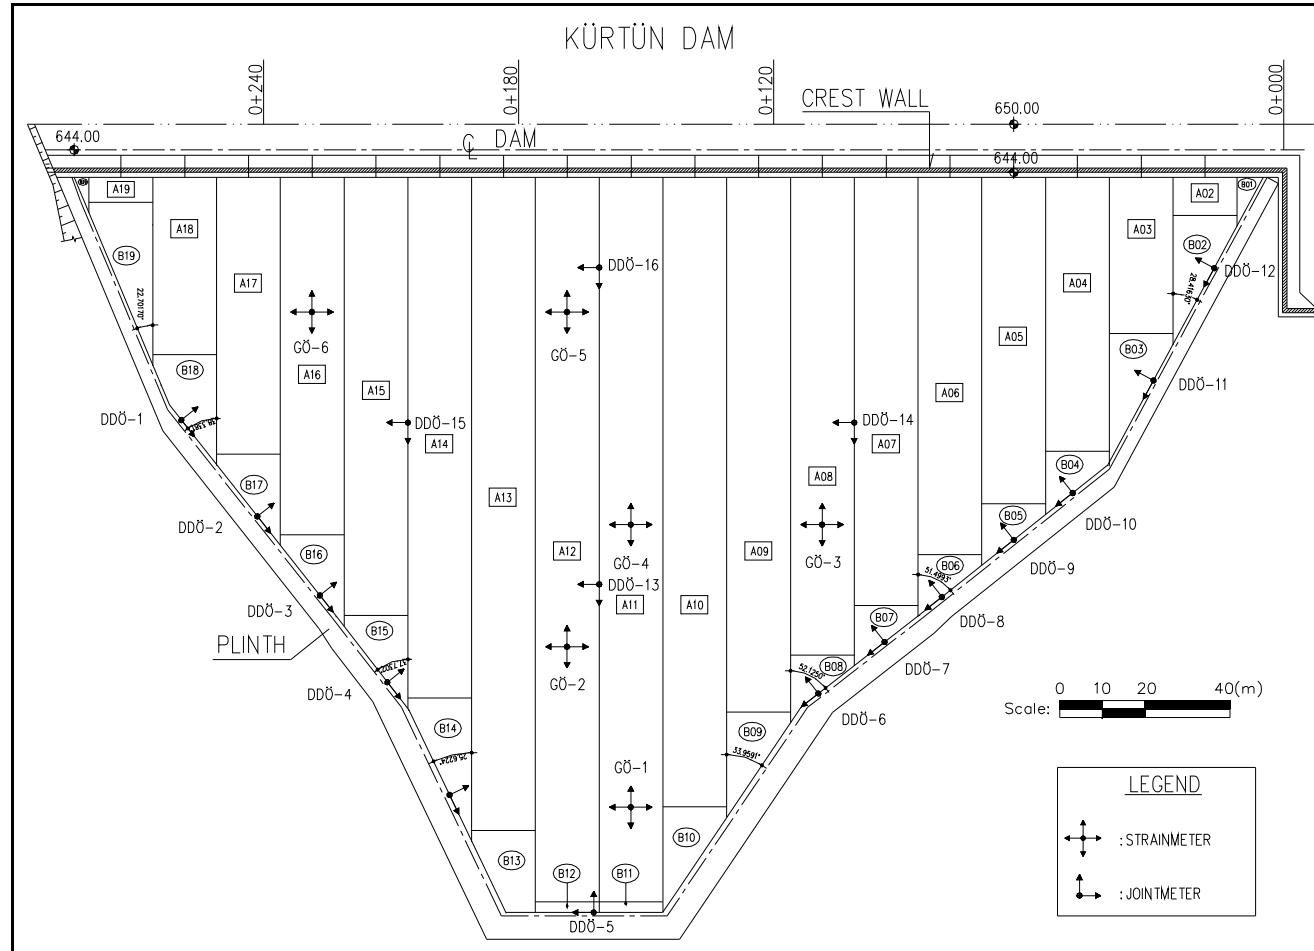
Locations of jointmeters and strainmeters at concrete membrane of Kürtün dam
